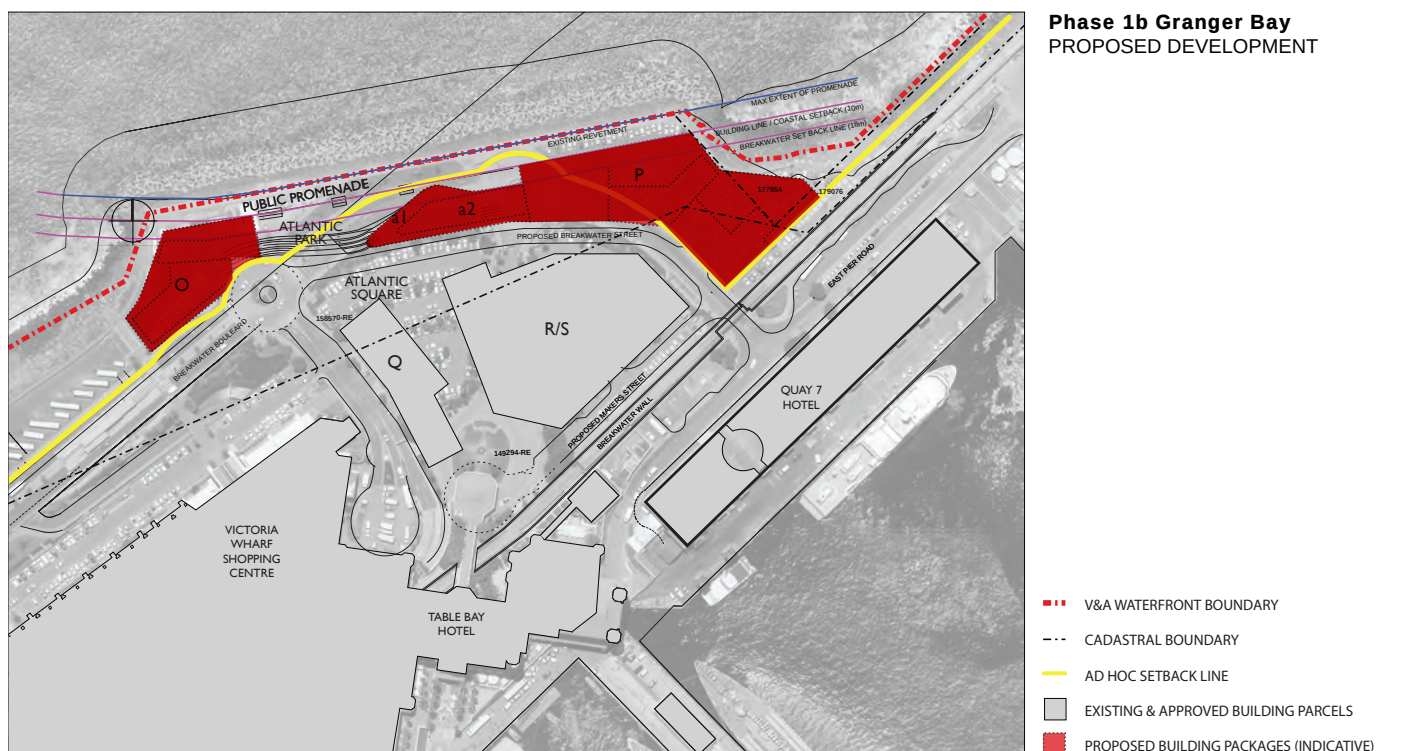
Site plan, showing the position of the proposed new structures in red. (Source: V&AW).
